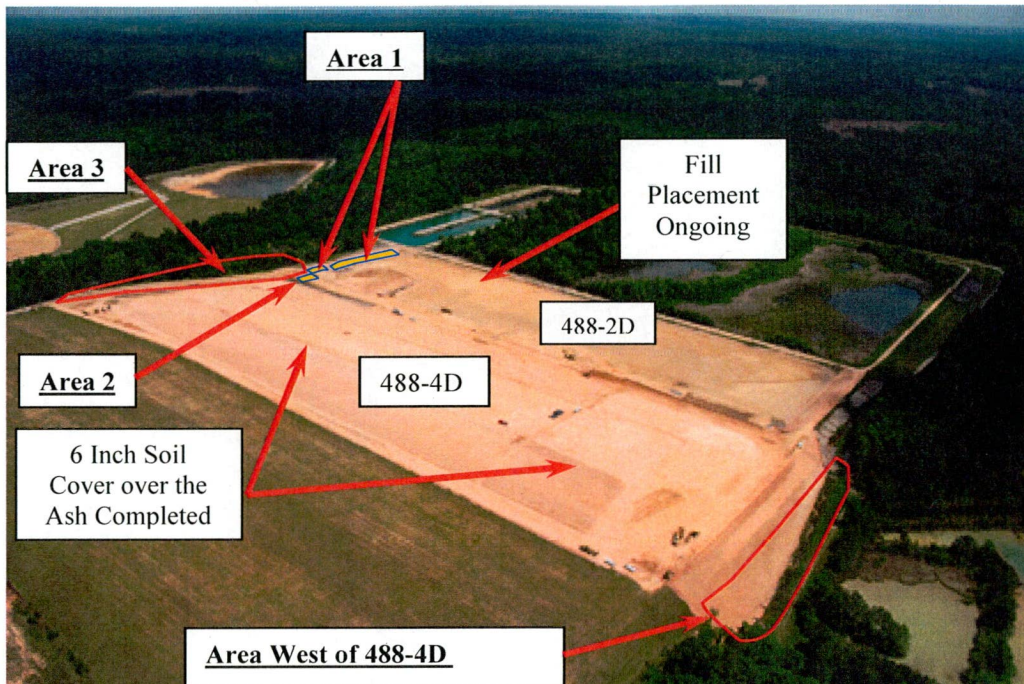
488-4D/488-2D Fill Placement 6-Inch Soil Cover/488-4D
